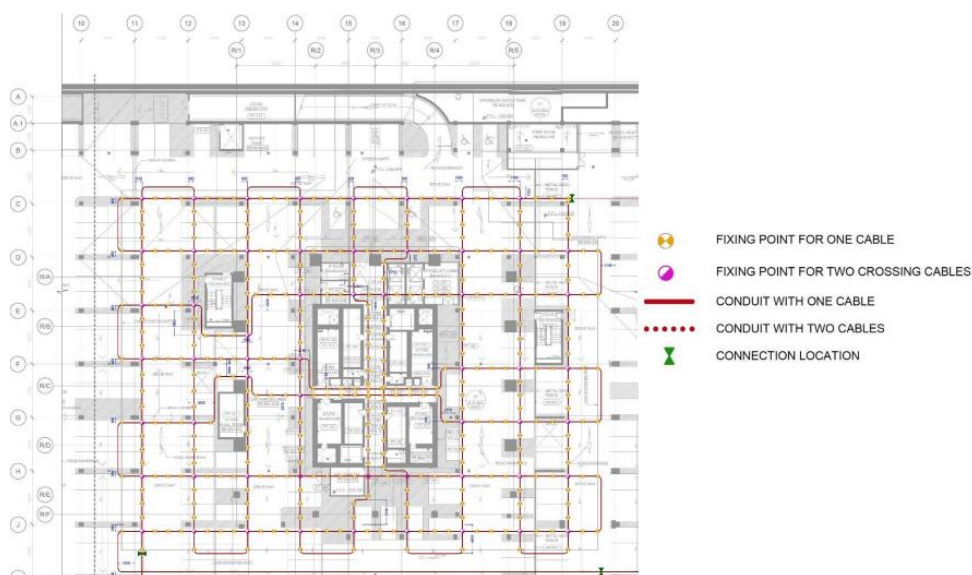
Part plan of cable routing in Block R monitoring area on B4 slab
